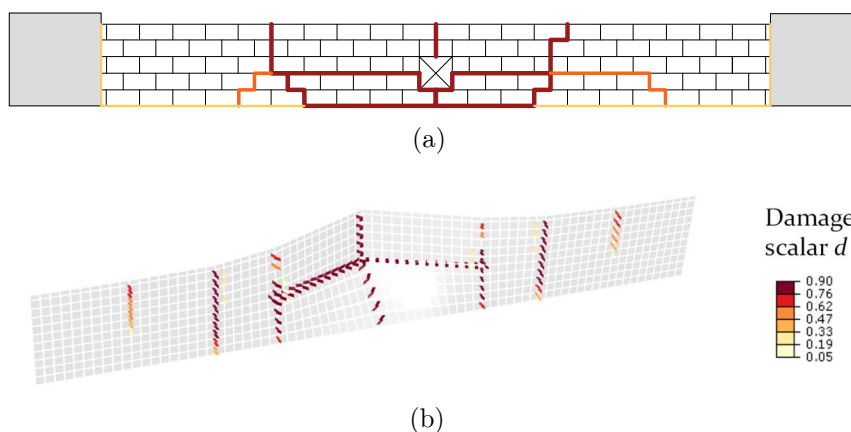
Damage pattern for the parapet C6/C7: (a) observed after the experimental campaign (adapted from Gilbert et al. (2002a)); and (b) for the applied load wall side, horizontal cracks and vertical cracks.
